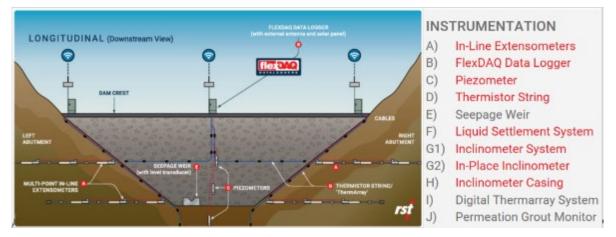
A typical overview of the in-situ dam monitoring schemes for an earthfill dam ^[18].
